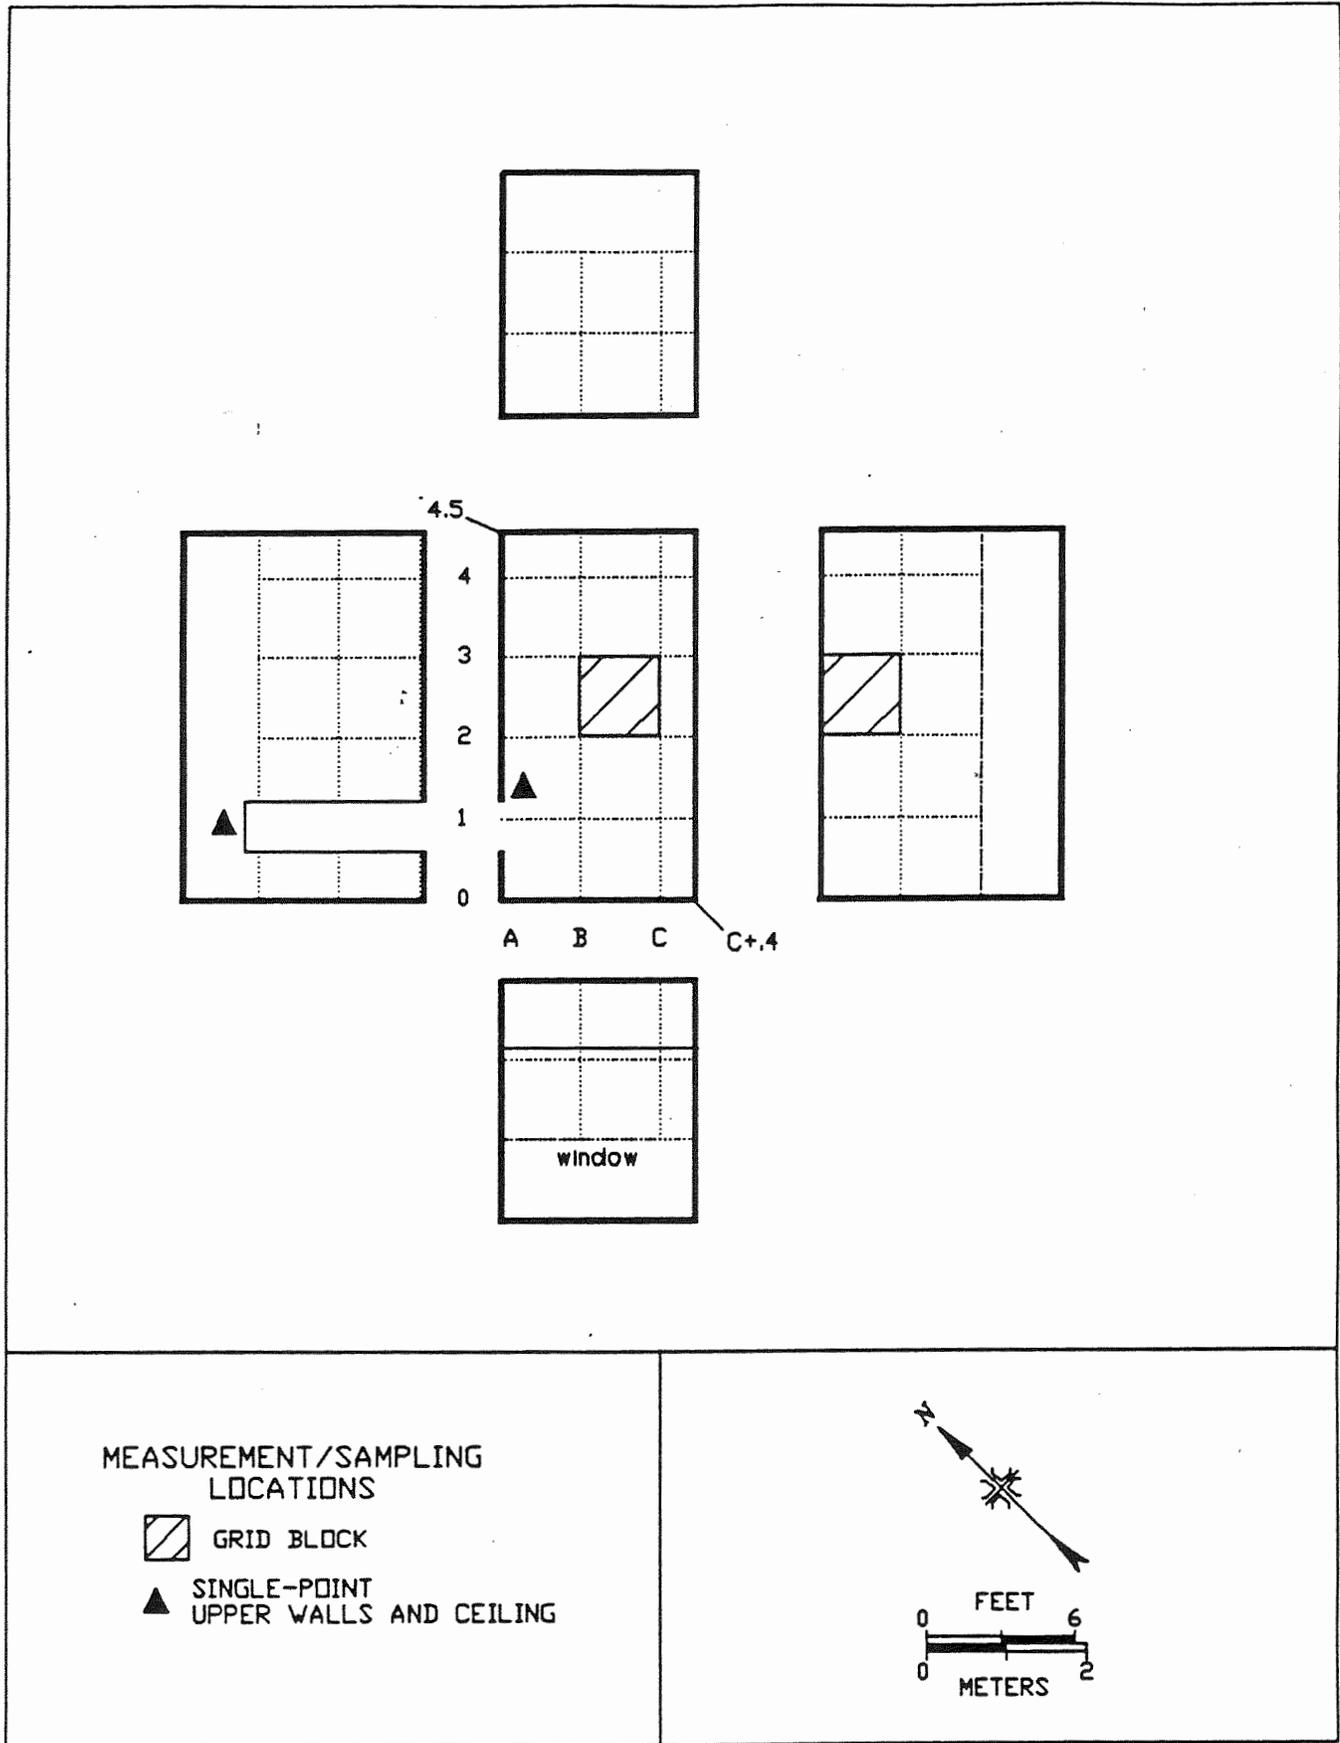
Building 005, Room 111A - Measurement and Sampling Locations
